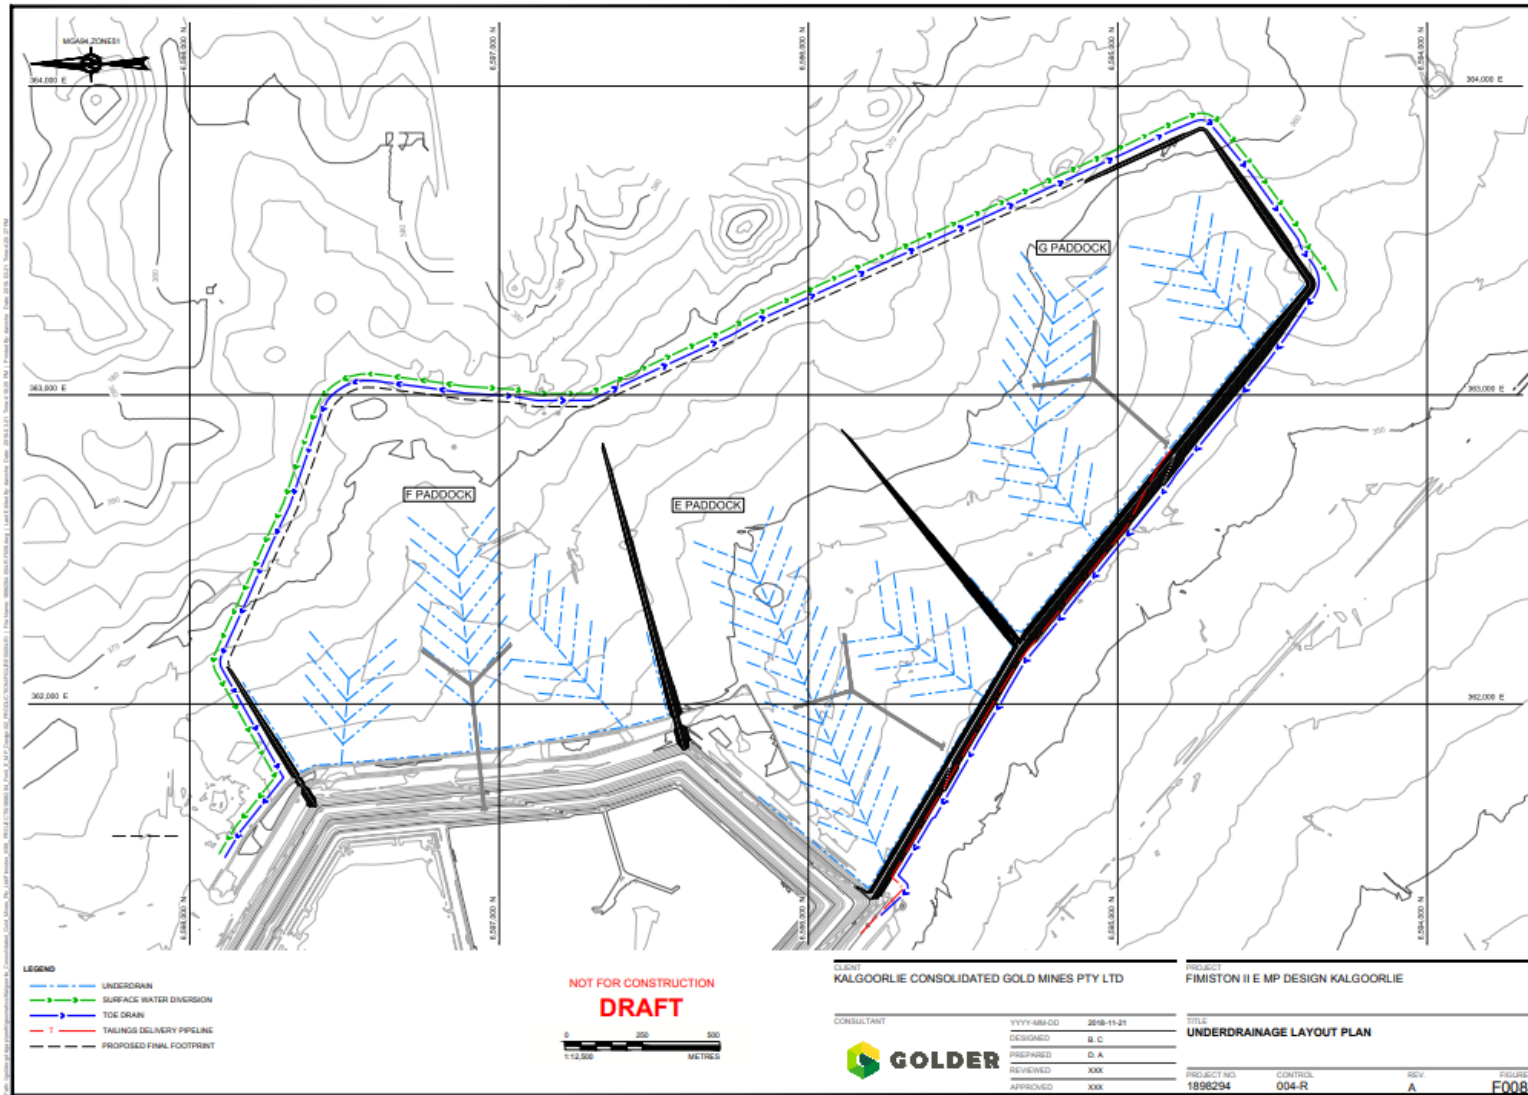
Plan view of Fim II Extension TSF showing underdrainage system
